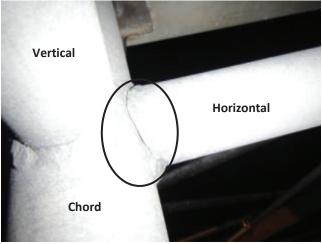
Broken weld at horizontal truss to chord connection
